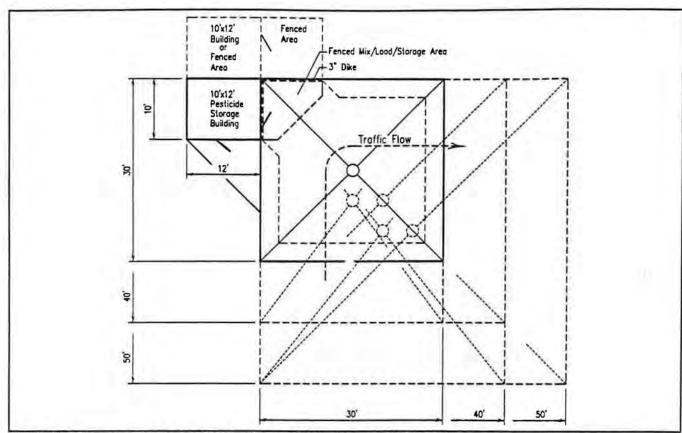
Modular mixing/loading pad with offset pesticide storage building abutting corner of pad.
